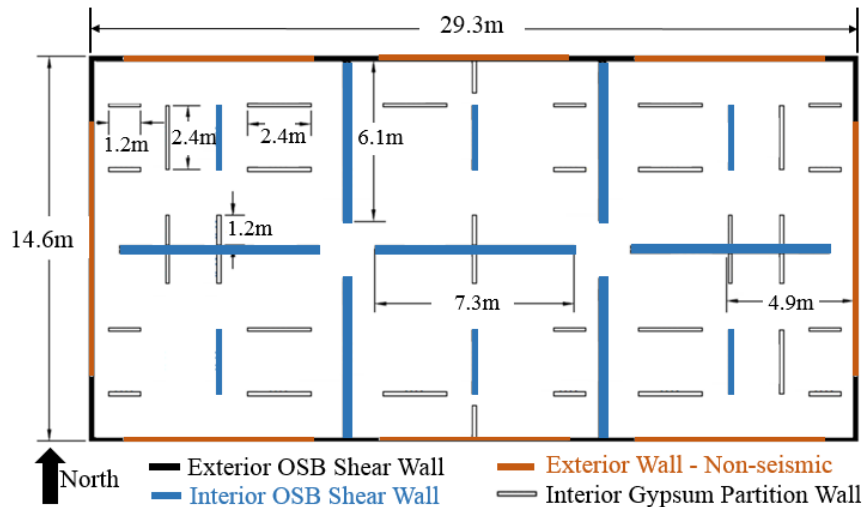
Plan view of the shear and bearing wall layout for the one-story multifamily building. (Original image provided by D. Jared DeBock and modified here).
